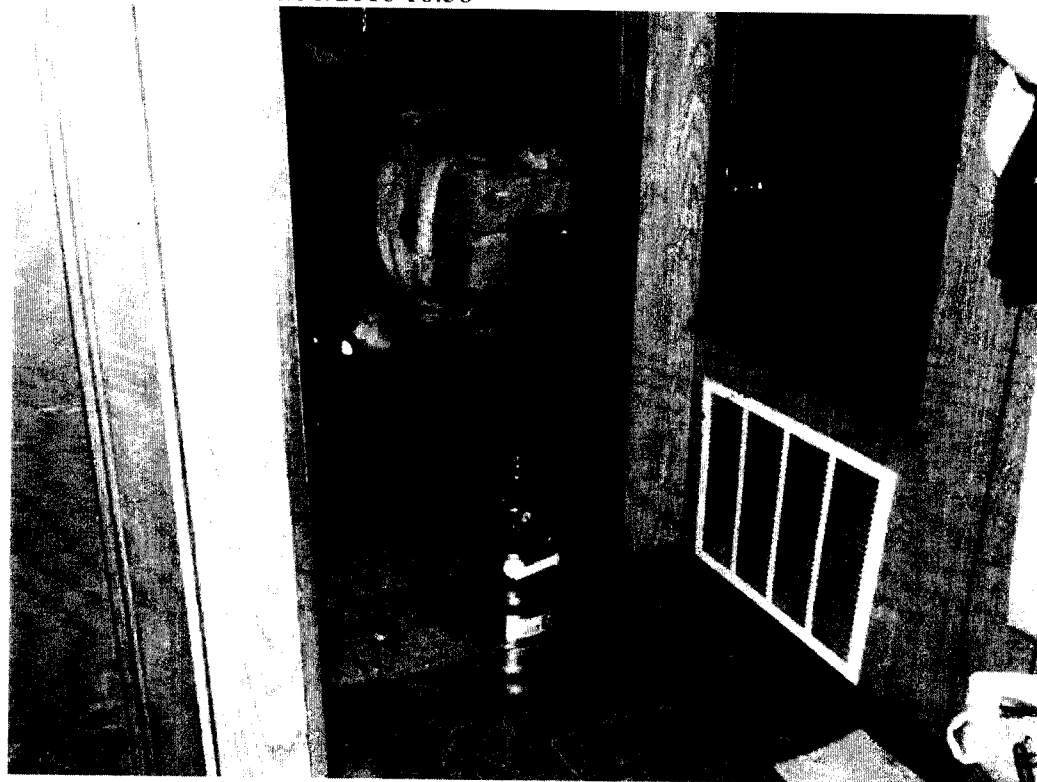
Sample station GM115 – 126 Lyon Drive Sub Slab Soil Gas Sample Location
